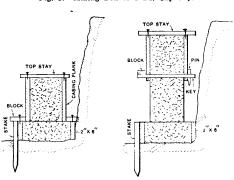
Section Showing Footing and First Layer of Wall.
